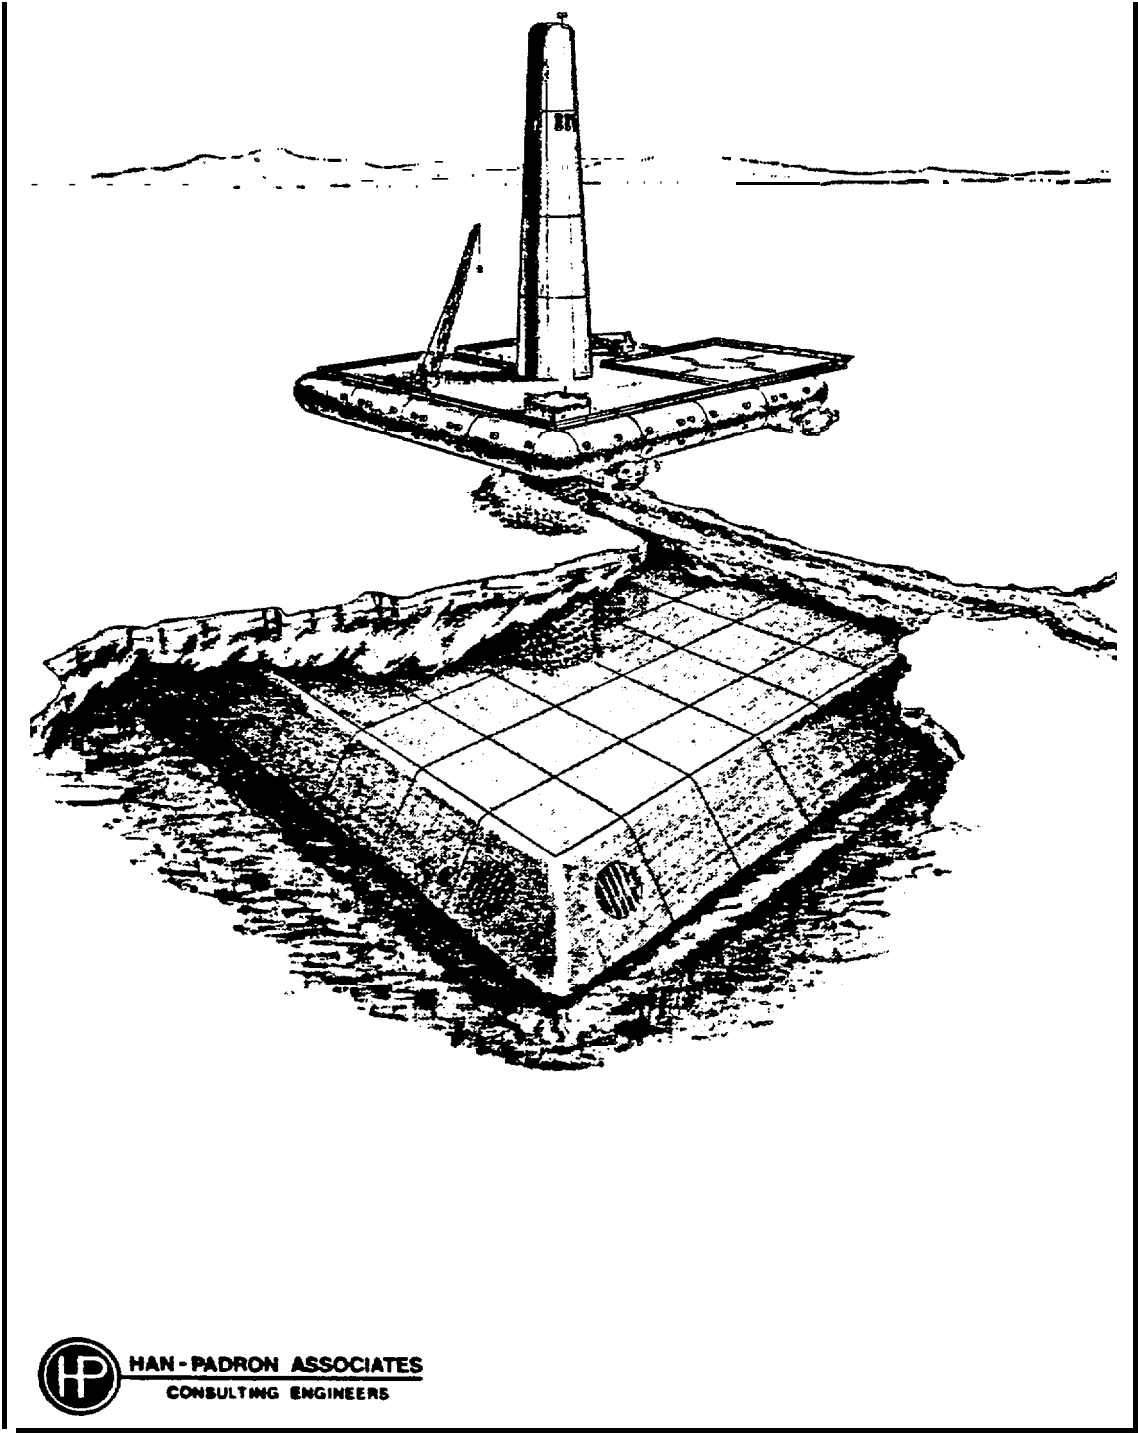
Bottom Mounted Ice-cutting Platform.
